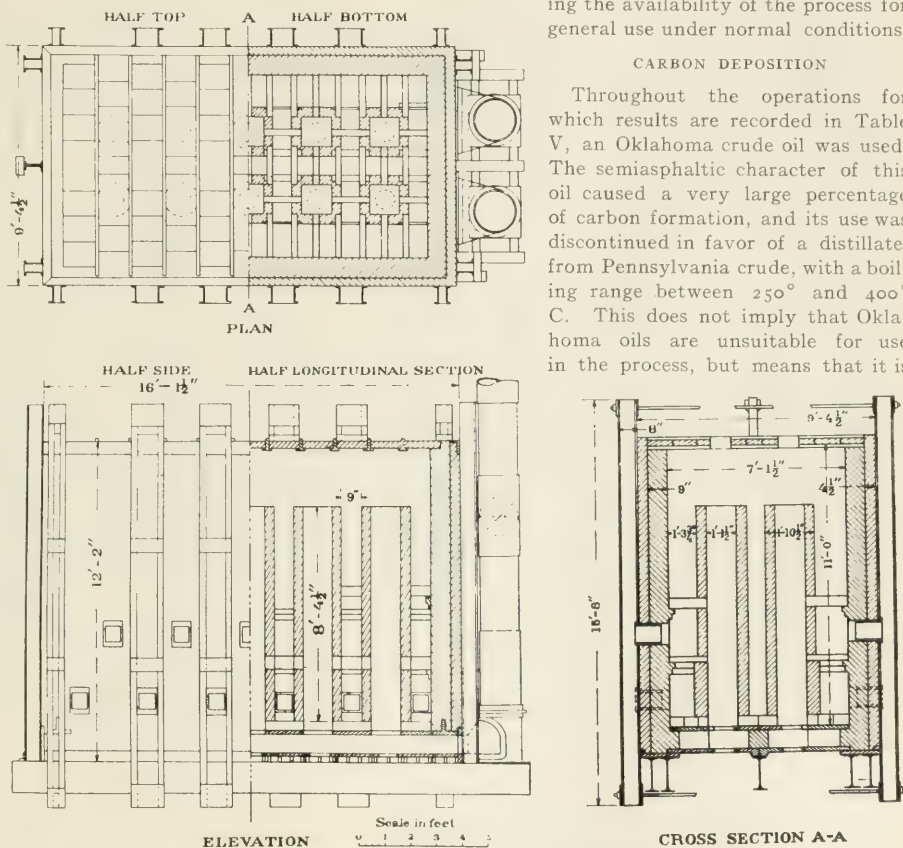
FIG. IV. PLAN, ELEVATION AND CROSS-SECTION OF FURNACE AT DEVELOPMENT PLANT
